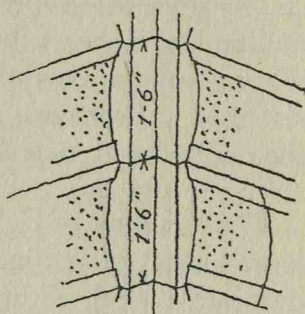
Priene. Corner of temple retaining wall, looking up.
